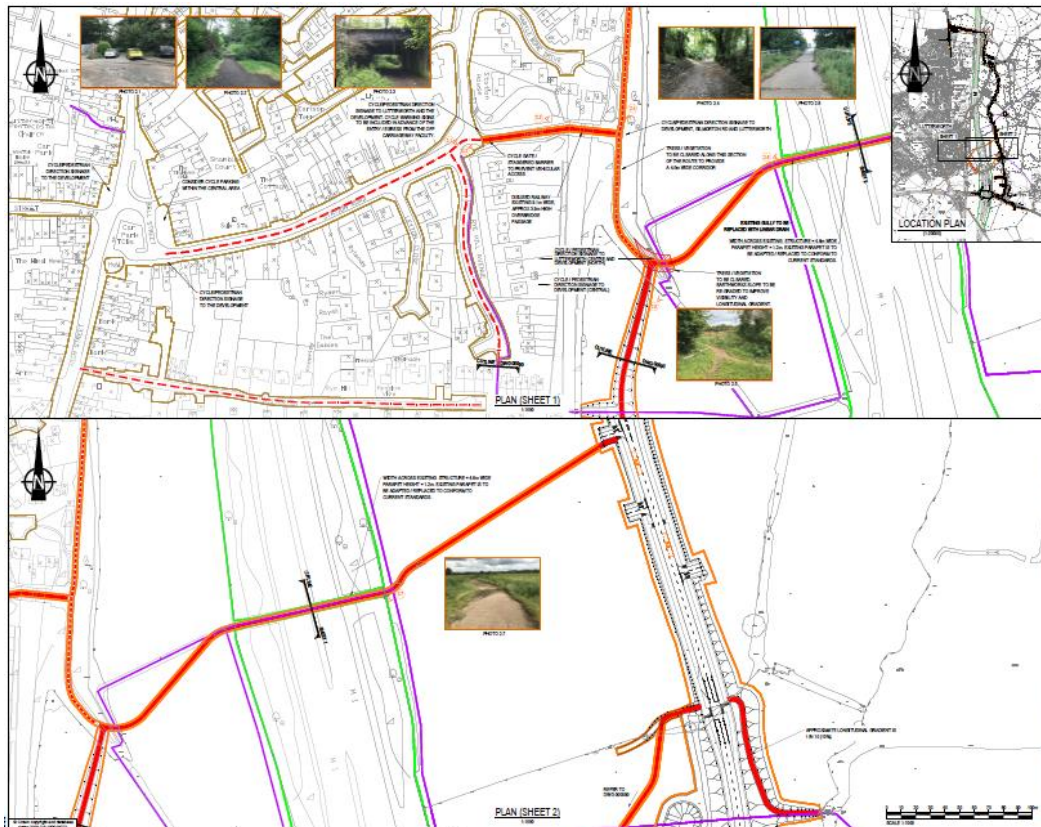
Non-Motorised user plan indicating proposed M1 “farm bridge” crossing and Station Road link
